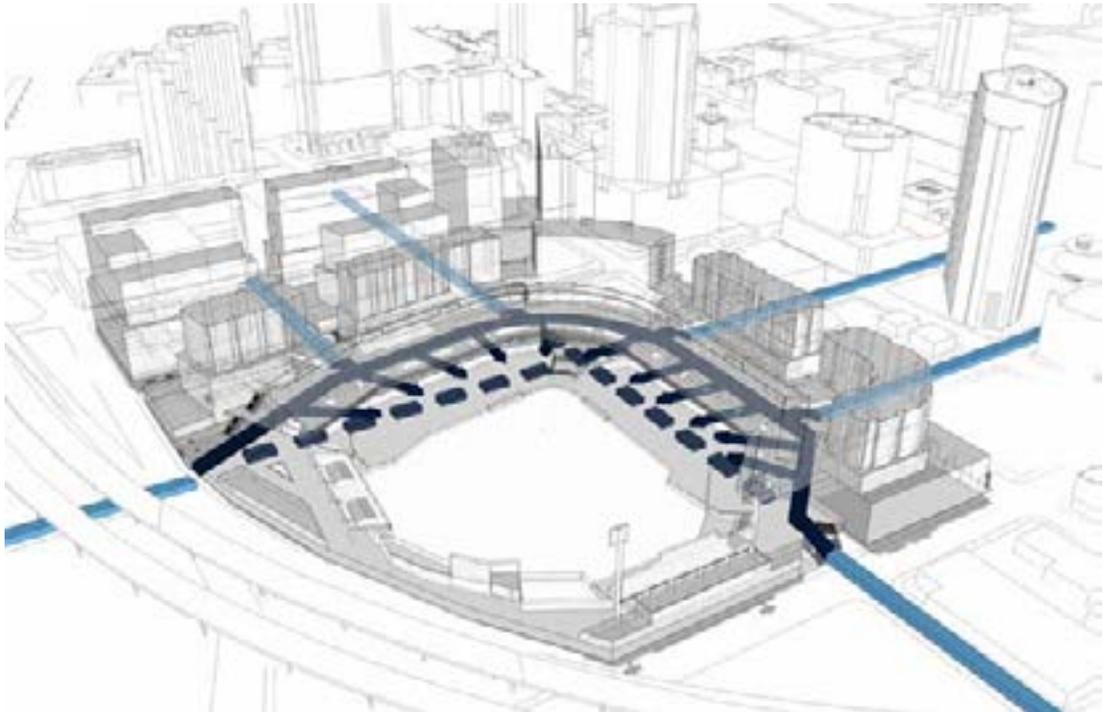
Main Concourse/2<sup>nd</sup> Level Retail Plan. Image by author.
